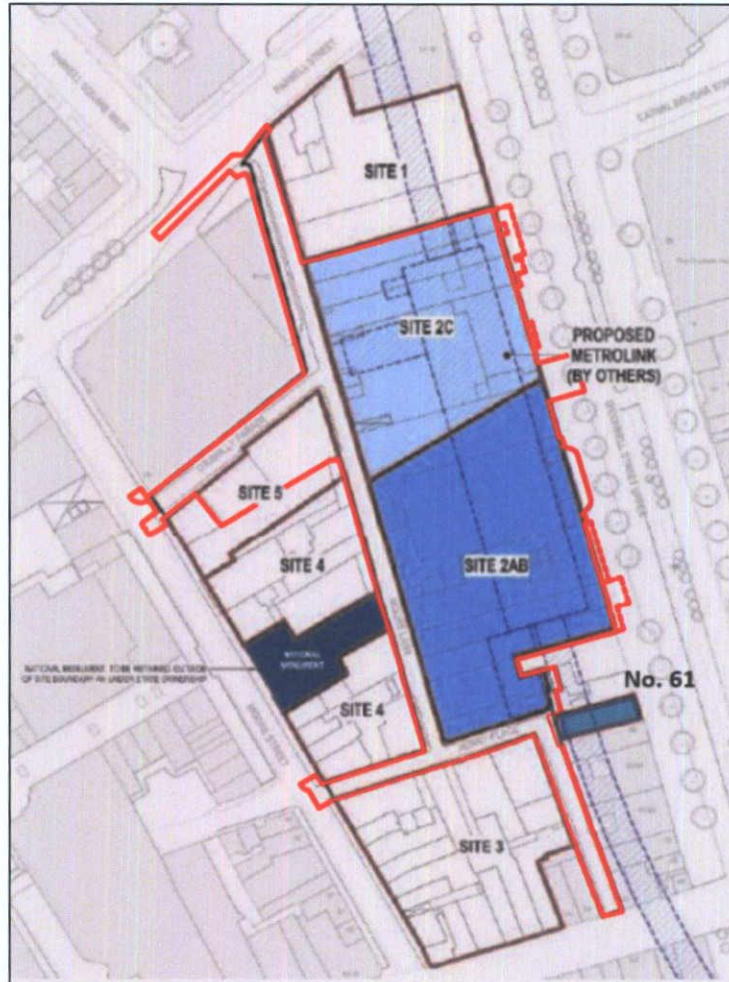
Location of the O'Connell Street Metrolink Station beneath Site 2 (2C and 2AB).
